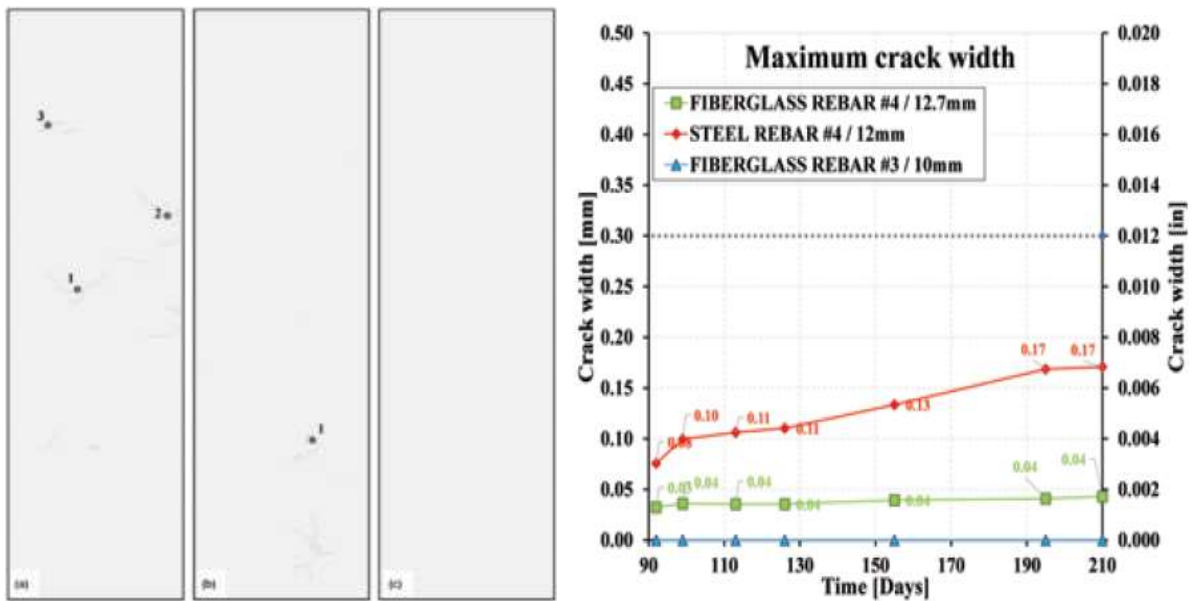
Outdoor Slab Crack Pattern (A) No.4 Steel Rebar (B) No.4 GFRP Rebar (C) No.3 GFRP Rebar Slab (Barragan et al., 2023)
